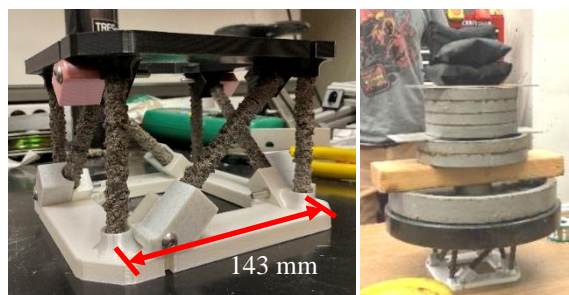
Regolith truss assembly (a) unloaded and (b) loaded with 34 kg.
